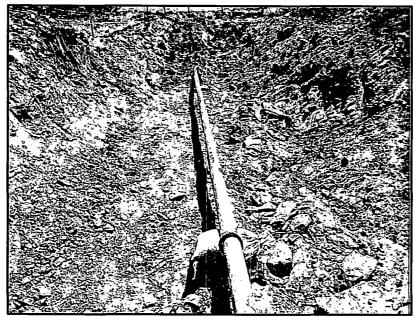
View of southern portion of GCU #89 E pipeline excavation.
